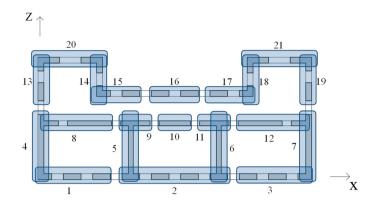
Sample of clusters subdivision of the ground floor walls.
